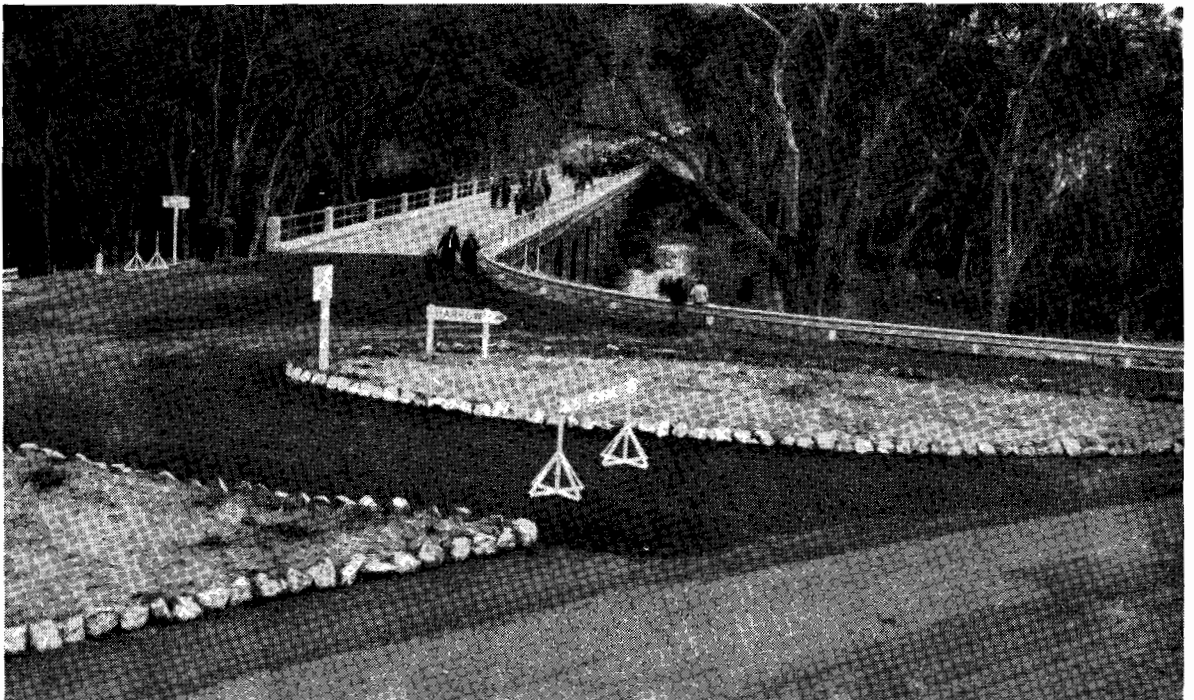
Shires of Kowree and Wannon. Coleraine-Harrow-Edenhope Road. Official opening of new bridge over Glenelg River.
